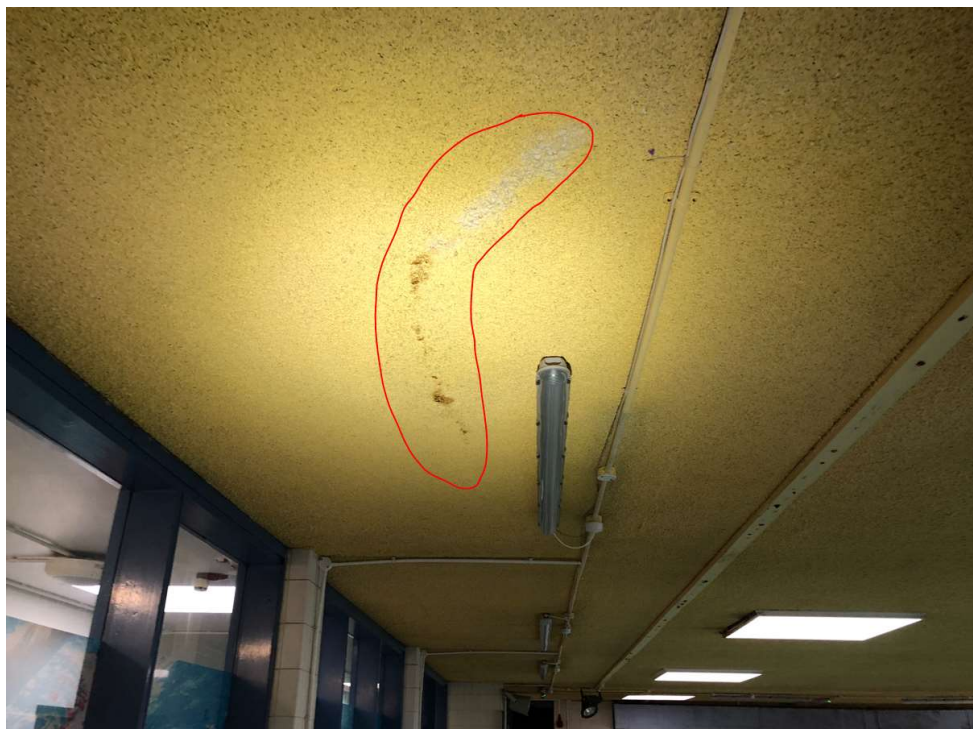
Further signs of reinforcement corrosion to the soffit of the Teaching Pool, staining the sprayed coating (circled in red on the photo).
